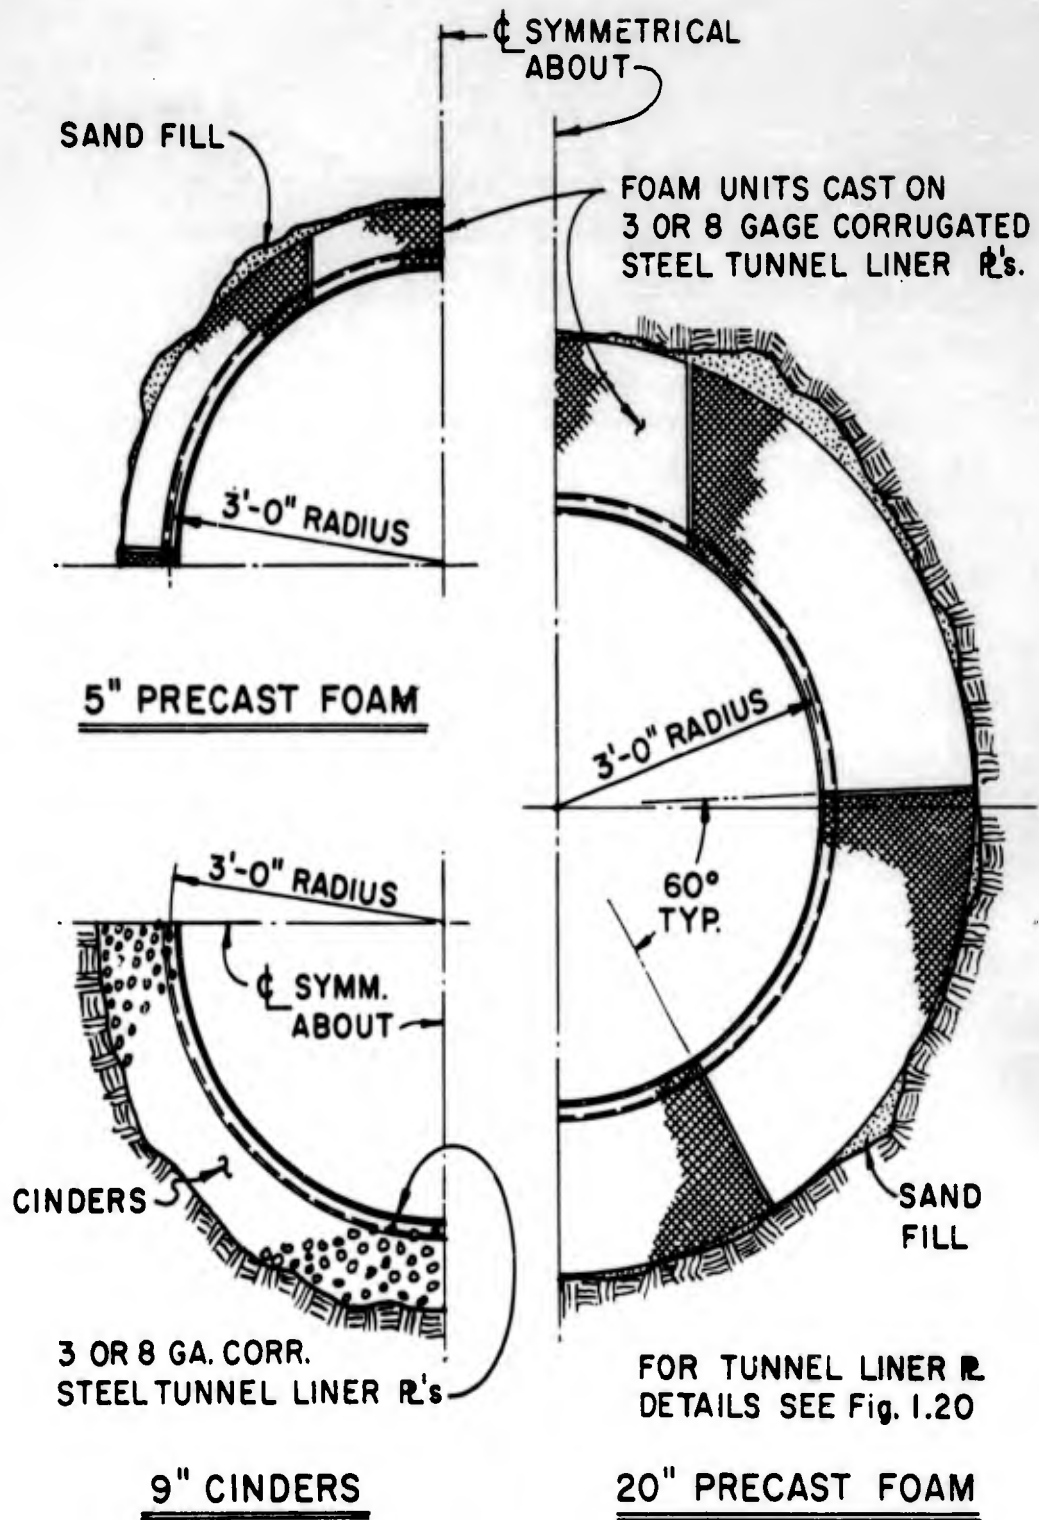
Partial sections of three types of corrugated steel tunnel liners.
